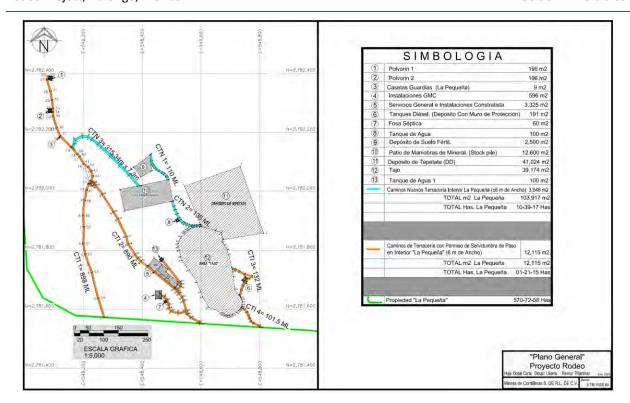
INFRASTRUCTURE PAD AND ACCESS ROAD
